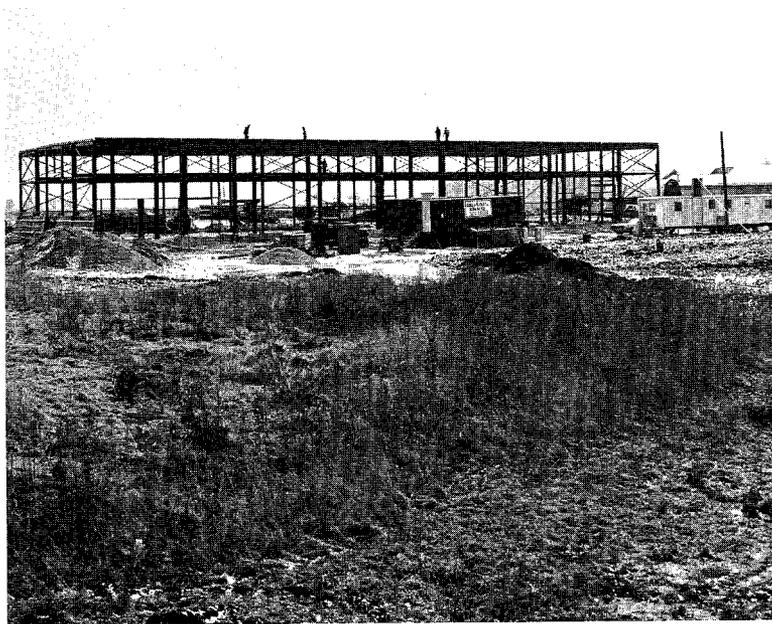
Progress on the third Industrial Building. The air building, now used as a warehouse, is behind.
